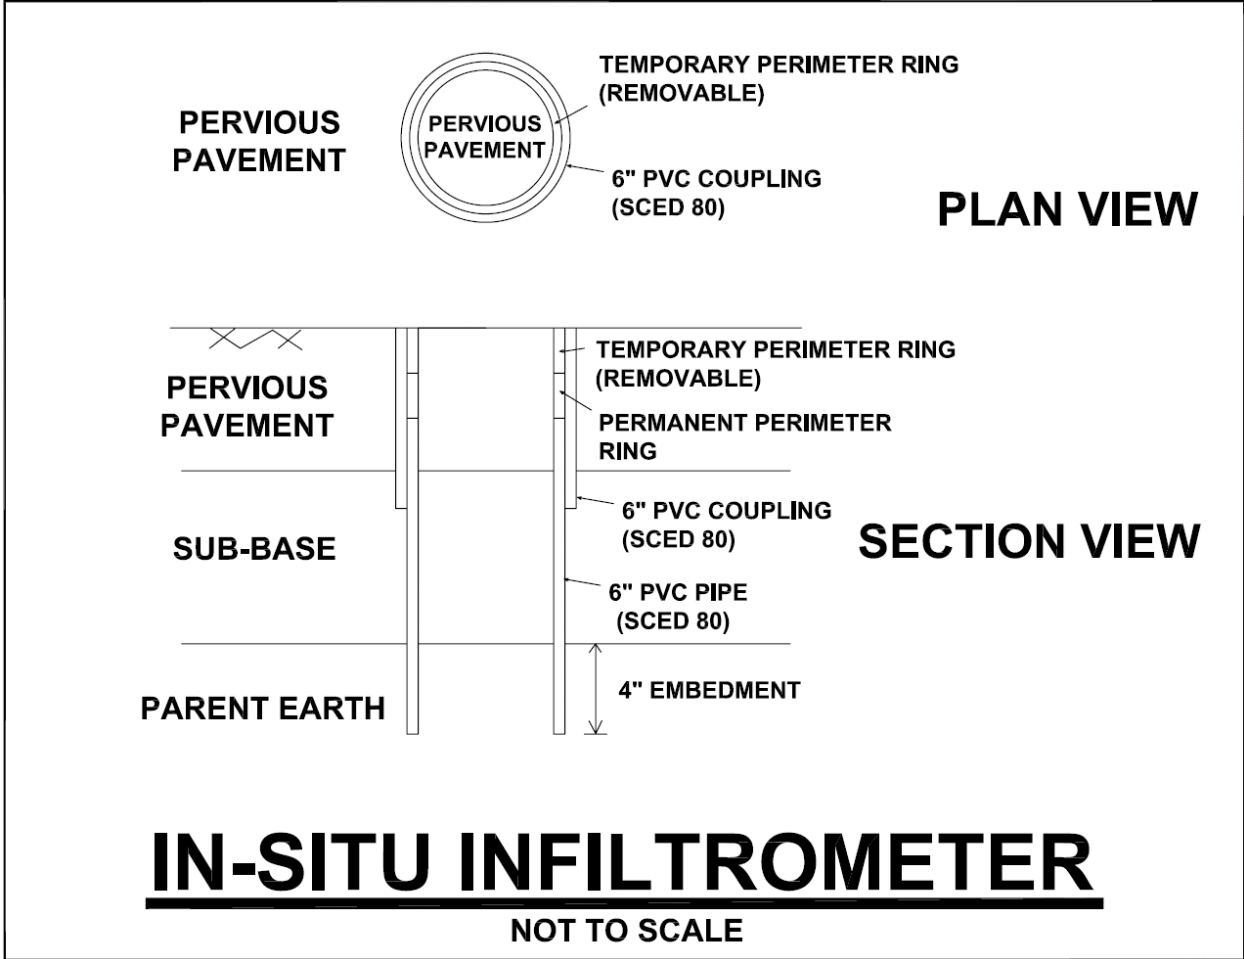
Plan View of ERIK In-Situ Infiltrometer
